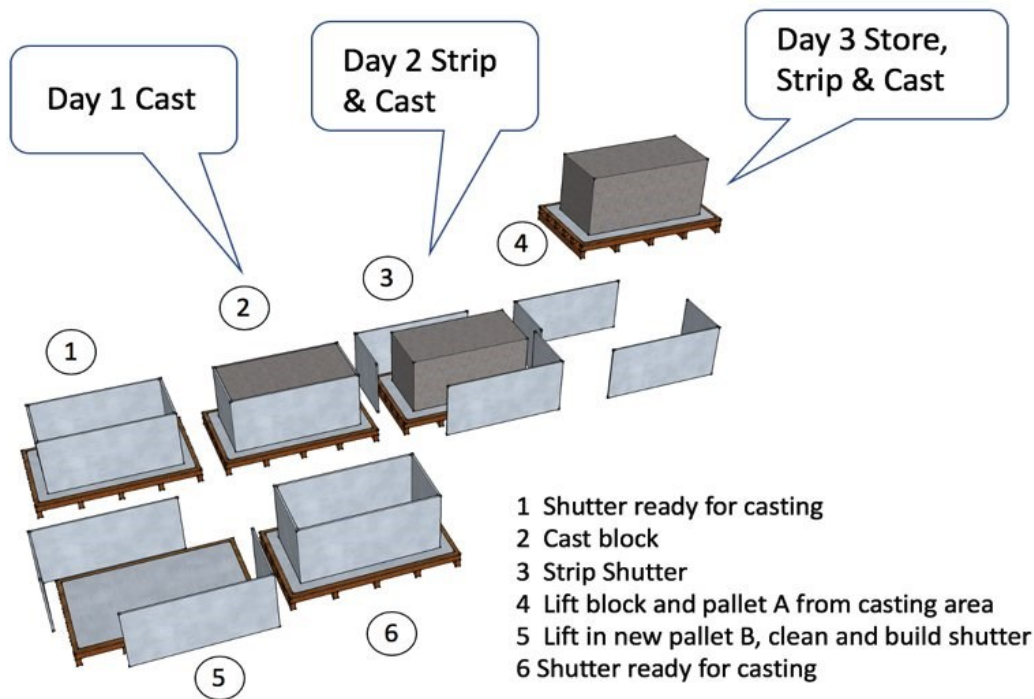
Principal stages in the manufacturing process of Precast Interlocking Concrete Blocks (PICB). (Fibo Intercon, 2023).
